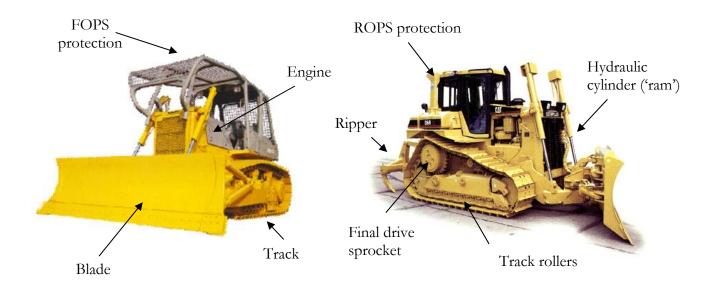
Key components of a bulldozer. The machine on the left has a fixed, outside mounted, universal blade. The machine on the right an inside mounted, power angle and tilt blade. The machine on the left is a forest machine with falling object protection system (FOPS).
